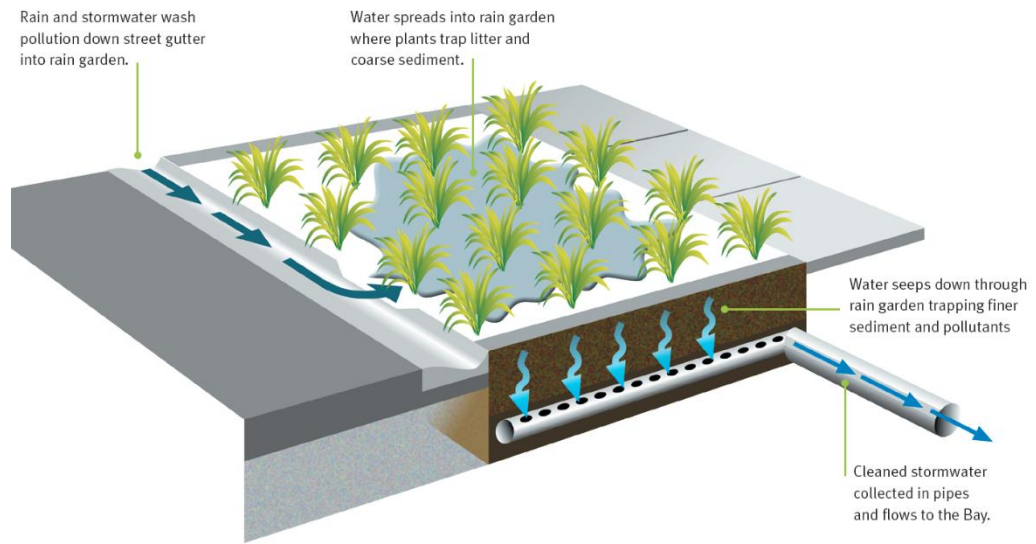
Typical rain garden. Source:www.kingston.vic.gov.au
